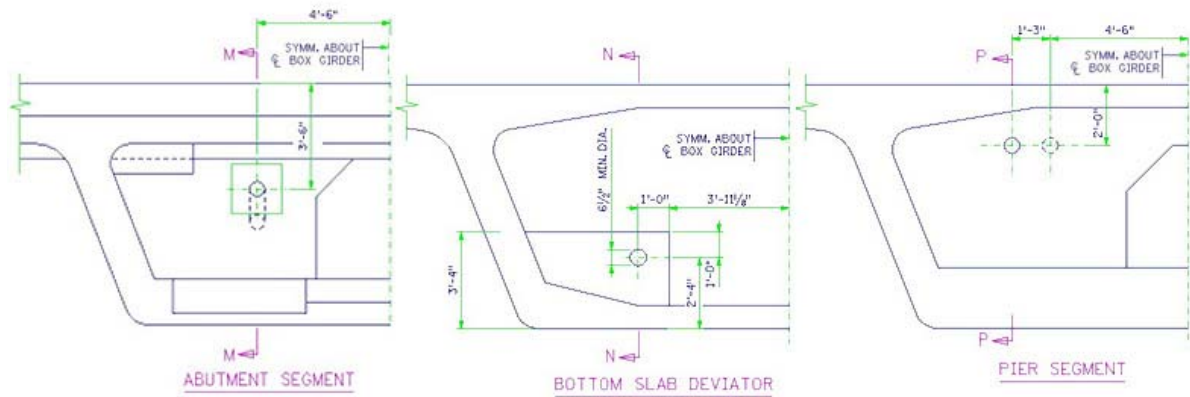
Future tendon path through abutment segment, deviator and pier segment.
